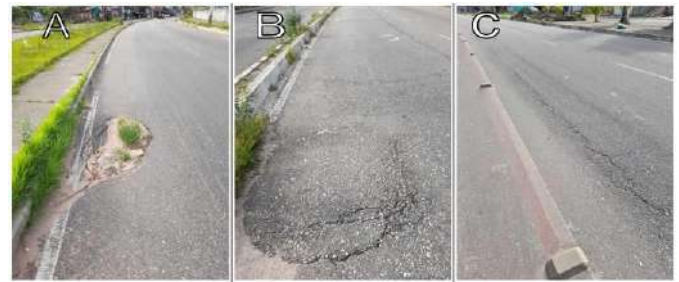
(A) Pot or hole; (B) Block-type crack; (C) Long longitudinal crack.
